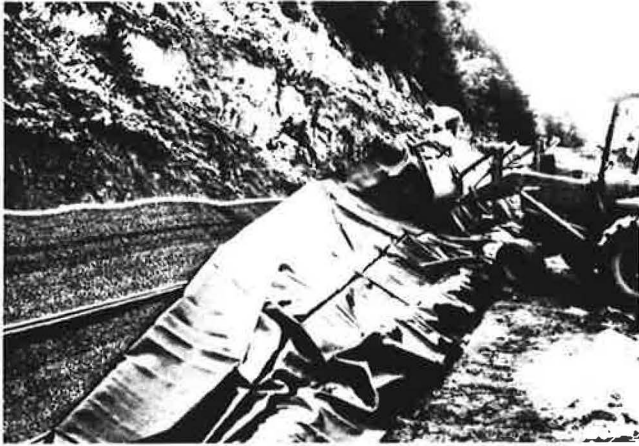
Installation of drain system on Mosquito Ridge Road.
